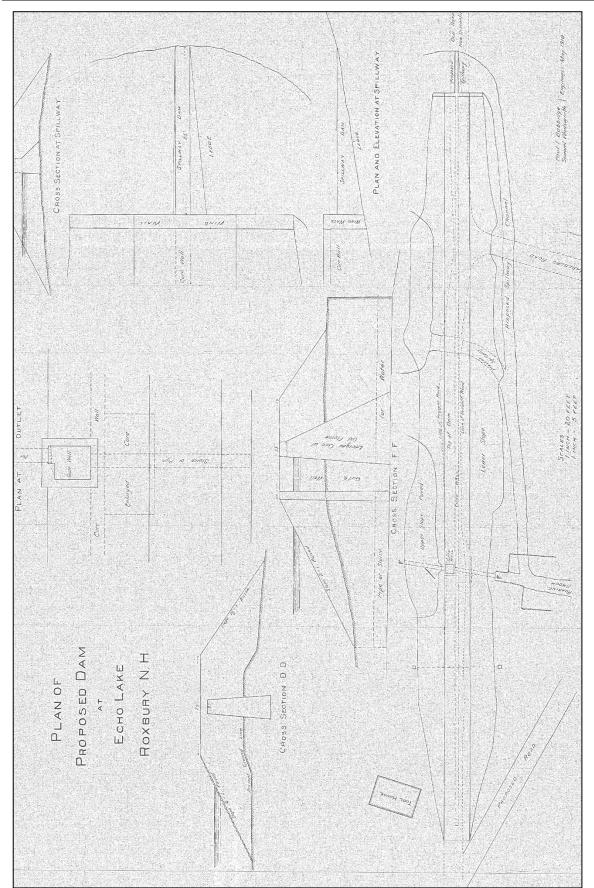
Plan of Proposed Dam at Echo Lake, showing extant "tool house" (Source: Babbidge & Wadsworth 1910).
